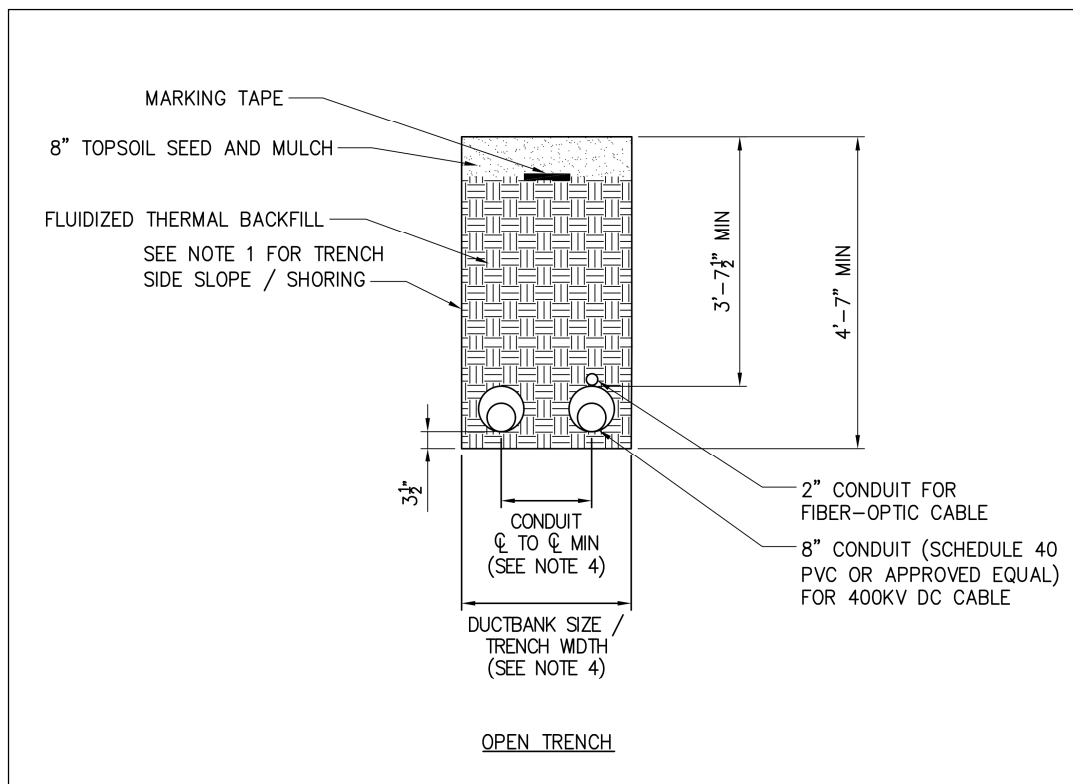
Typical open trench (railroad) installation of the cable illustrated.
